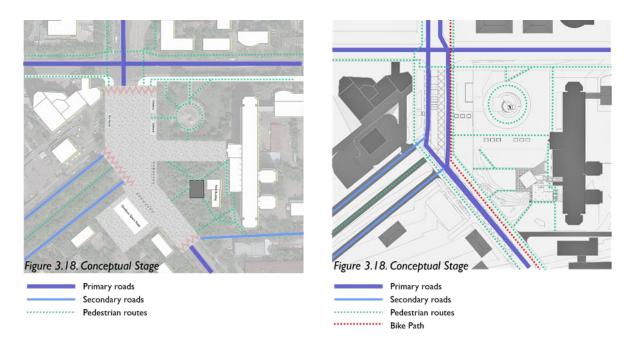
Conceptual connectivity concept (Source: Author's drawing)
